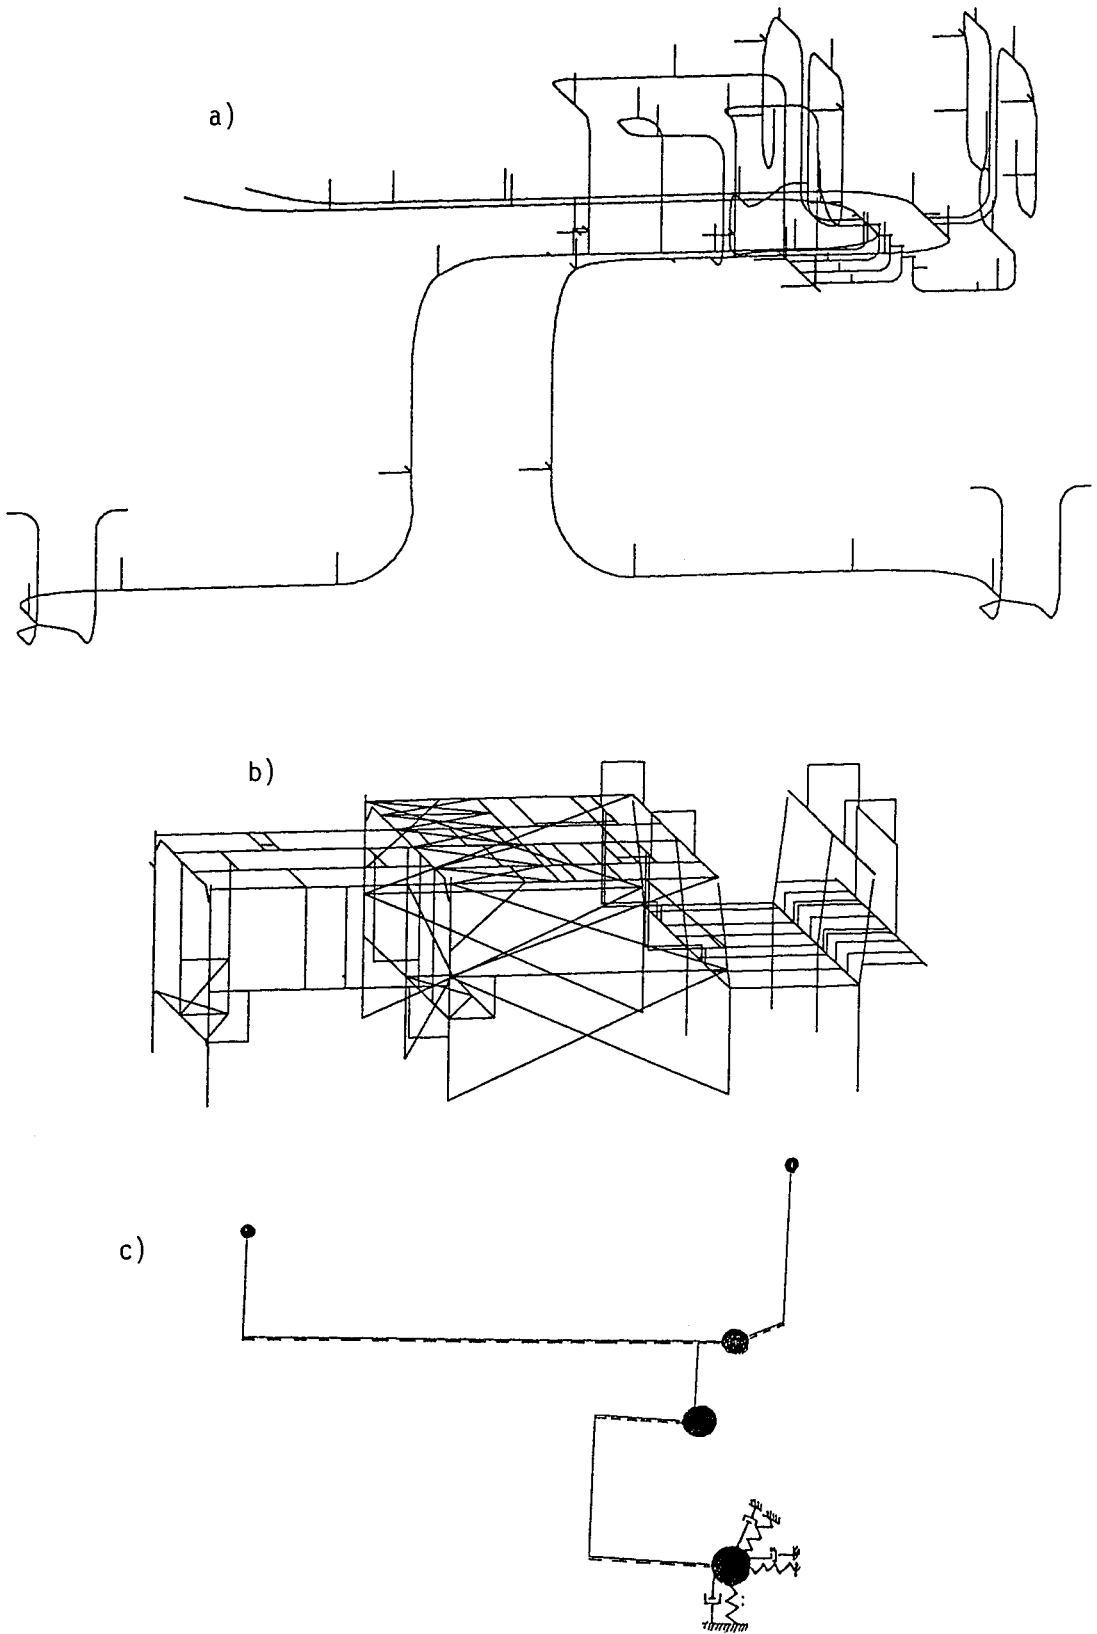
Computational model a) Piping (only LDF) b) Steel structure c) Building and ground
